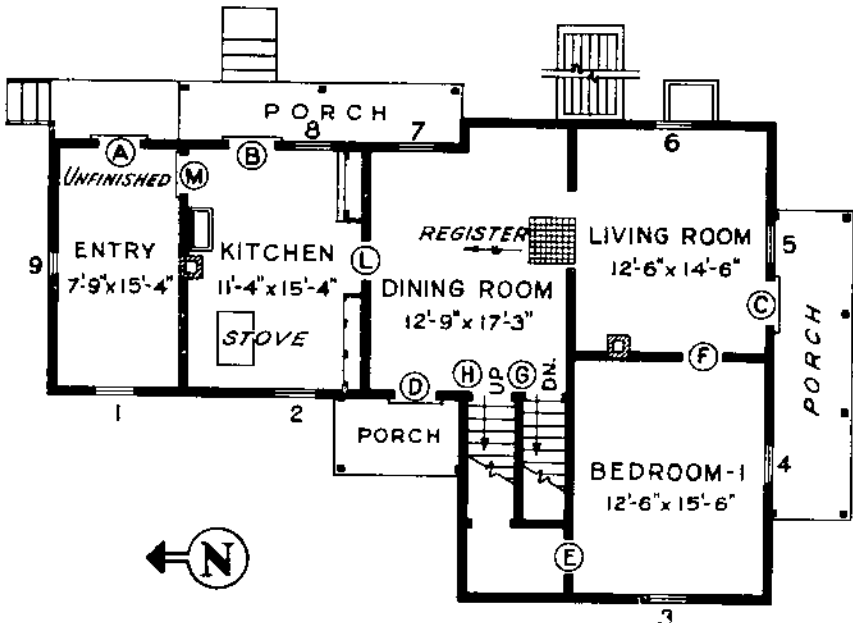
First-floor plan of house No. 7, showing location of equipment.
